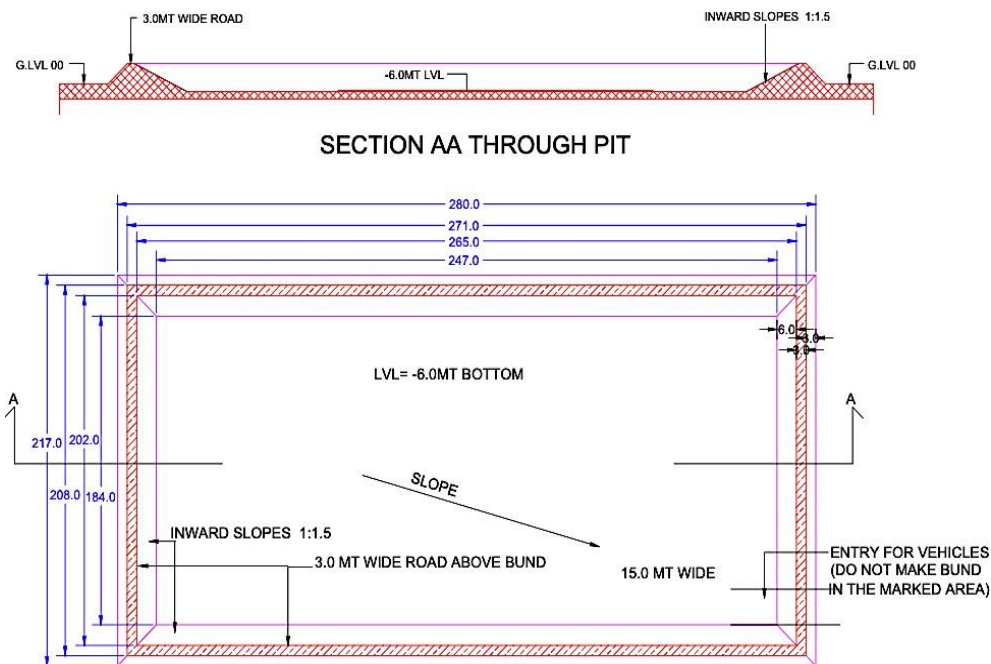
Detailed Drawing of Key Plan for Engineered Landfill. Notes: All dimensions in meter.
